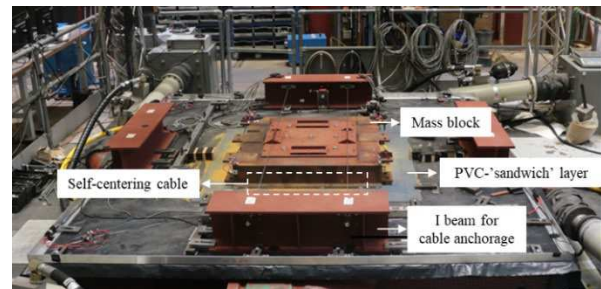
Test setup of the cable-s system specimen on the shaking table.
